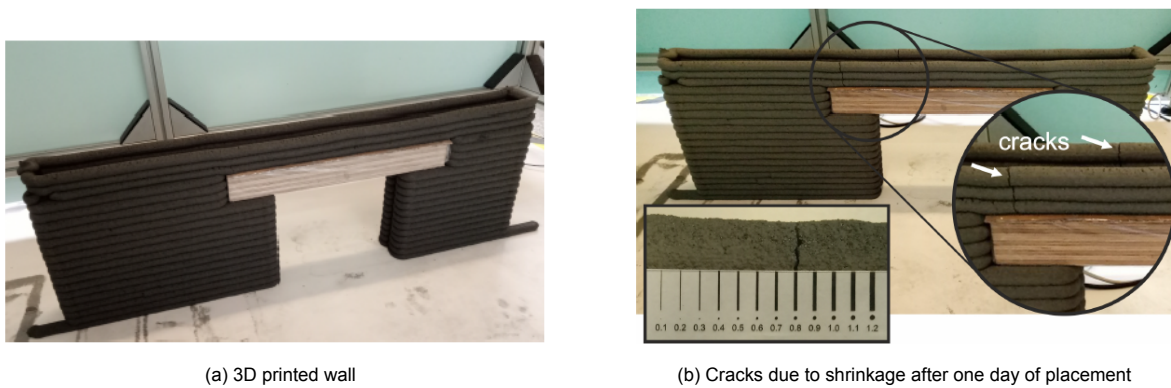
Shrinkage cracks in 3D printed wall, retrieved from [48]
